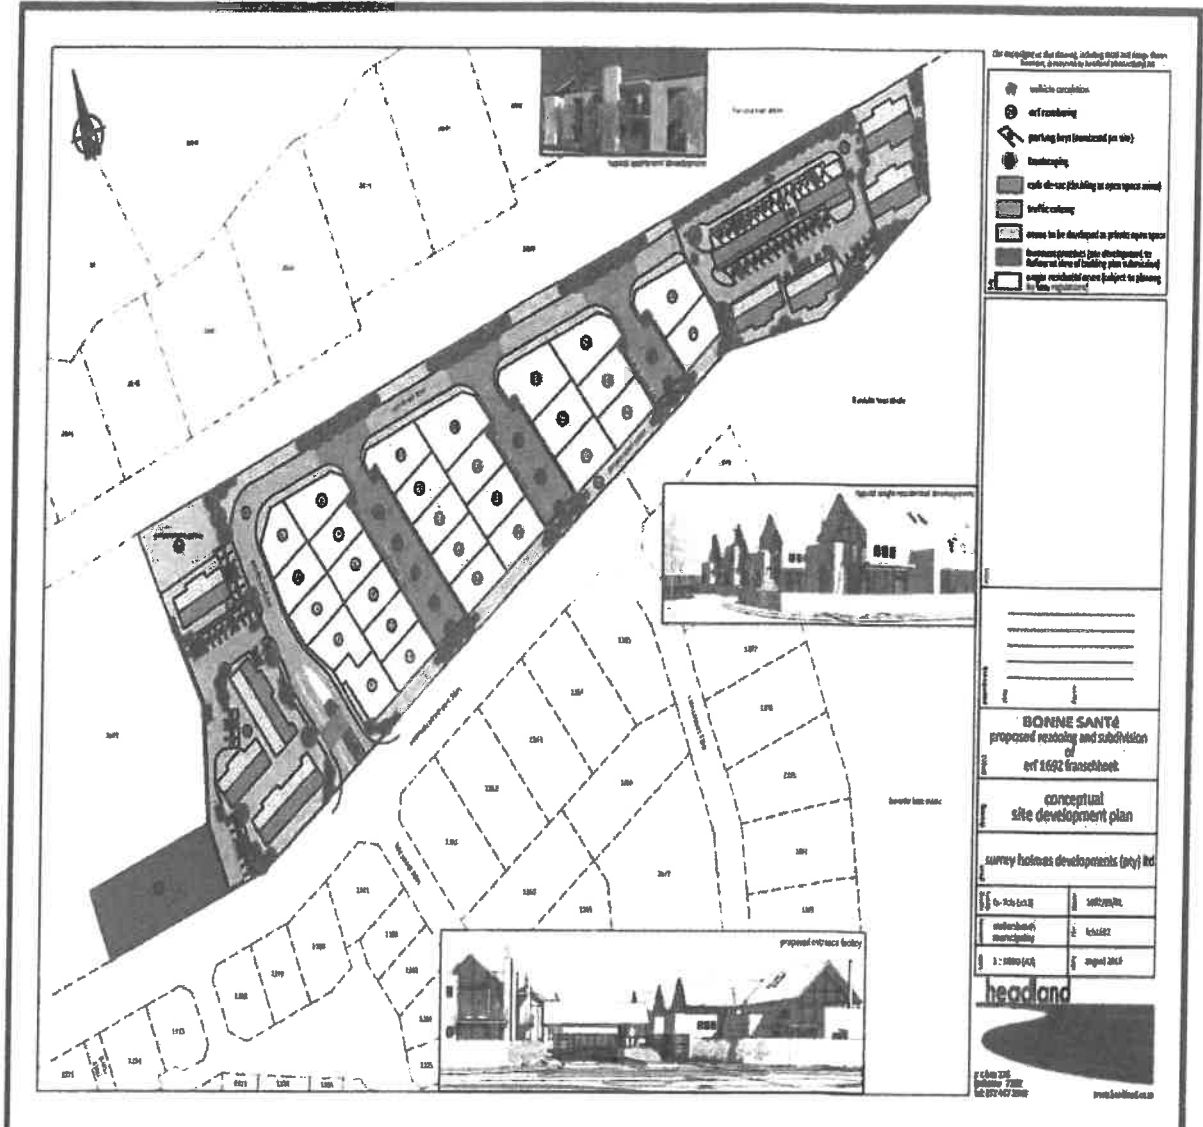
Site Development Plan for the development on Erf No. 1692, Franschoek.
